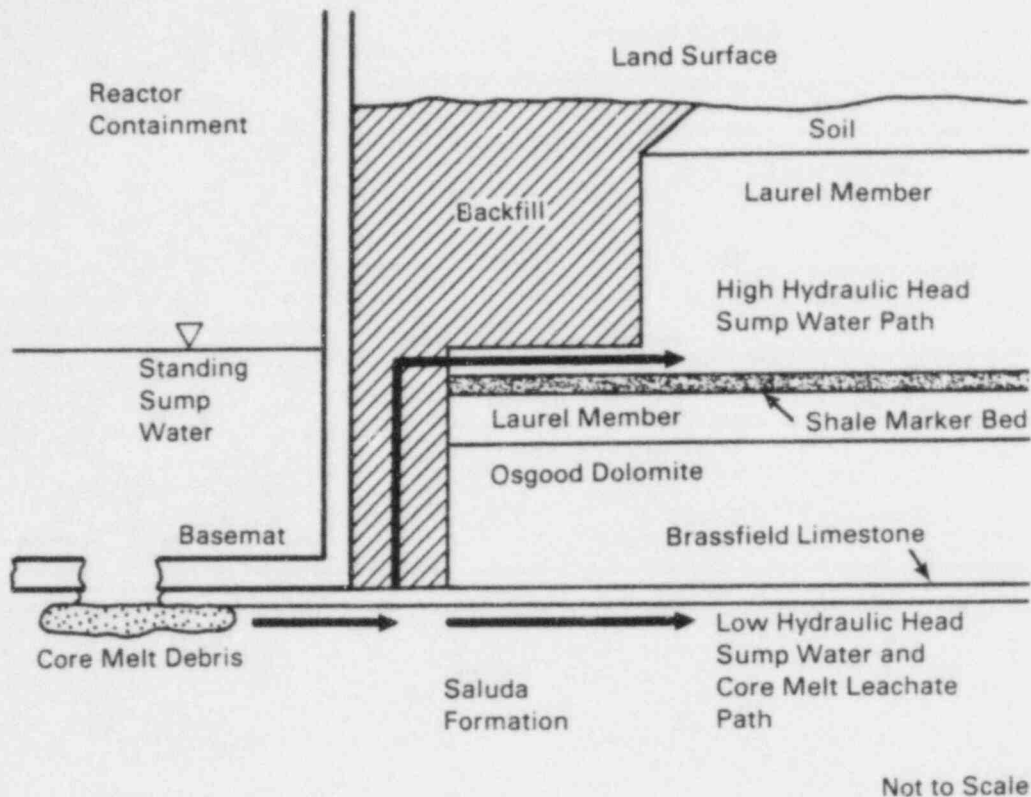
Hydrologic Units for High and Low Hydraulic Head Release of Sump Water
